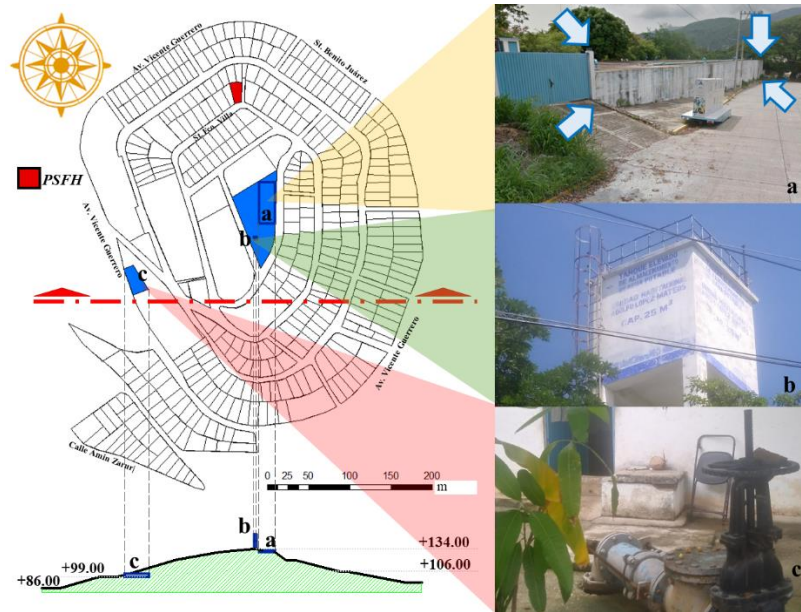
Location of BGA-2736 urban water and sanitary services equipment. (a) Hydraulic tank cap. 2,750 m³, (b) elevated hydraulic tank cap. 25 m³, and (c) sanitary overflow collector. PSFM= pattern single-family household. Elevations in meters above sea level.
